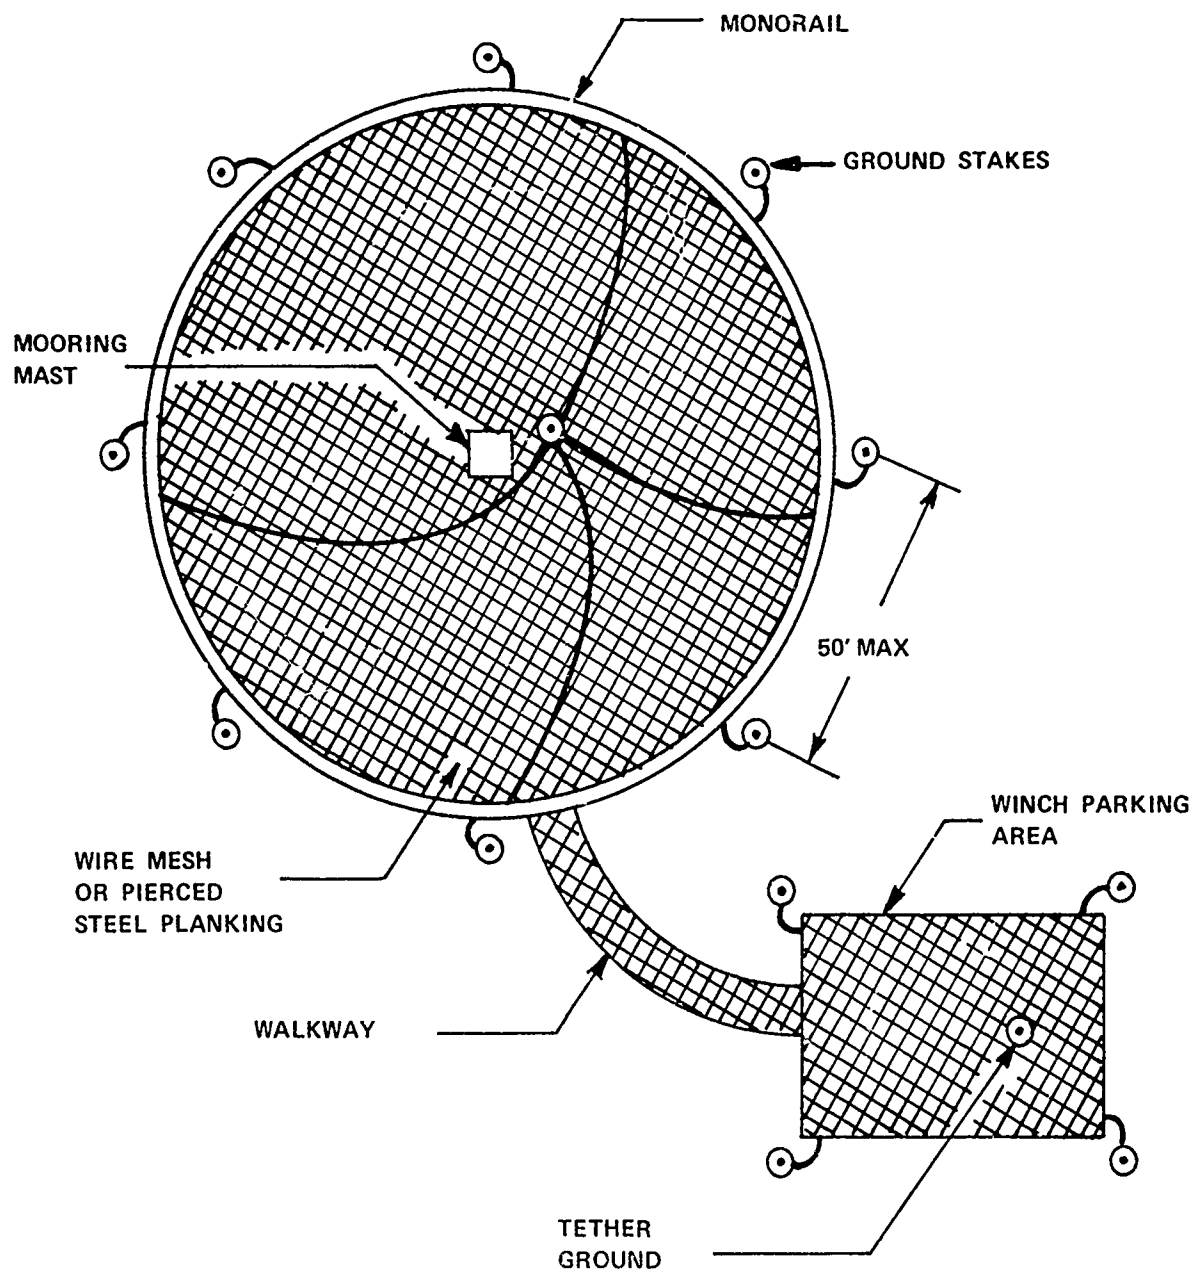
Grounding System for a Monorail Mooring System With Adjacent Winch Parking Area
